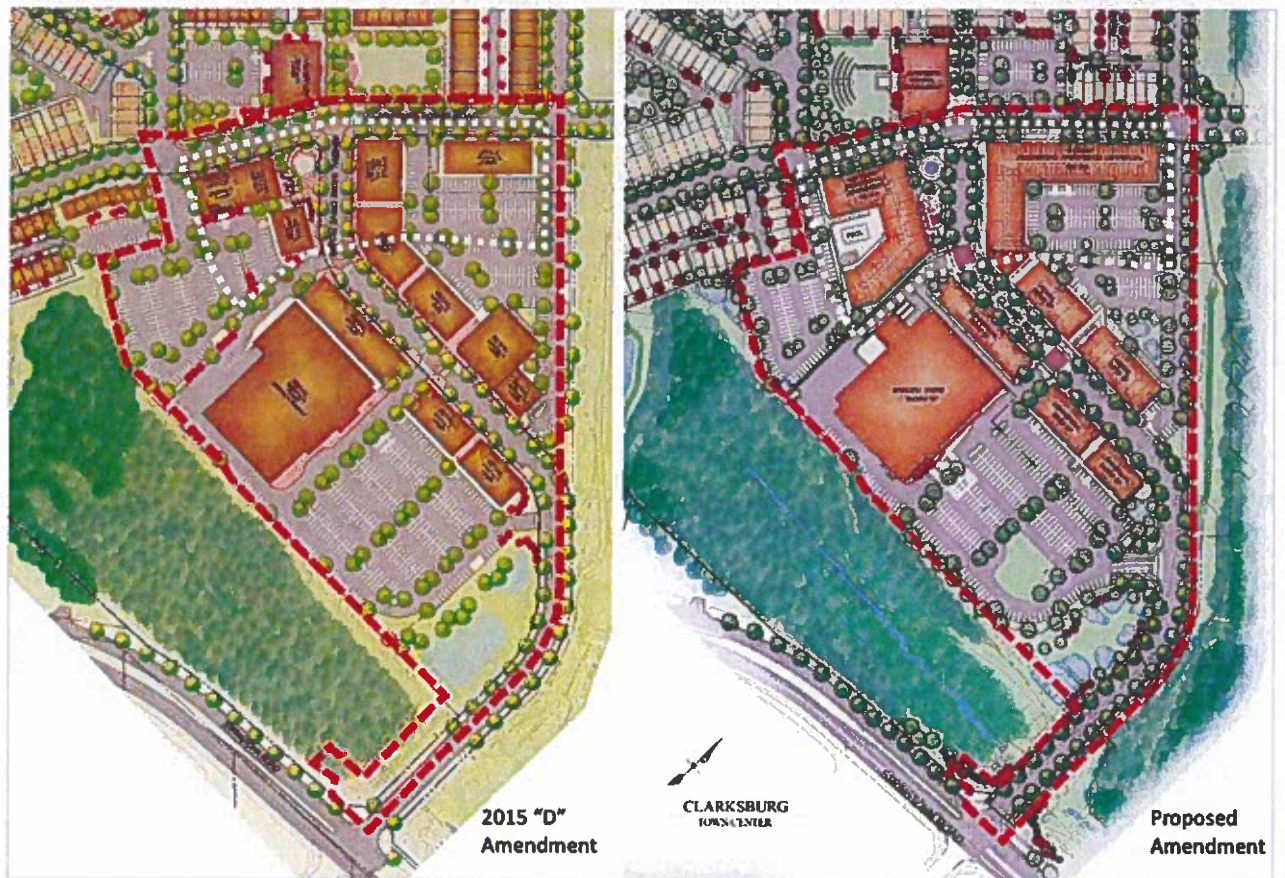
Renderings of the approved 2015 Site Plan Amendment (82007022D) (left) and proposed site plan amendment (right). The dotted white boundary identifies the location of prior office space (left) and the proposed residential units (right). Other buildings, uses and layout in the proposed amendment are substantially similar to the 2015 amendment.
